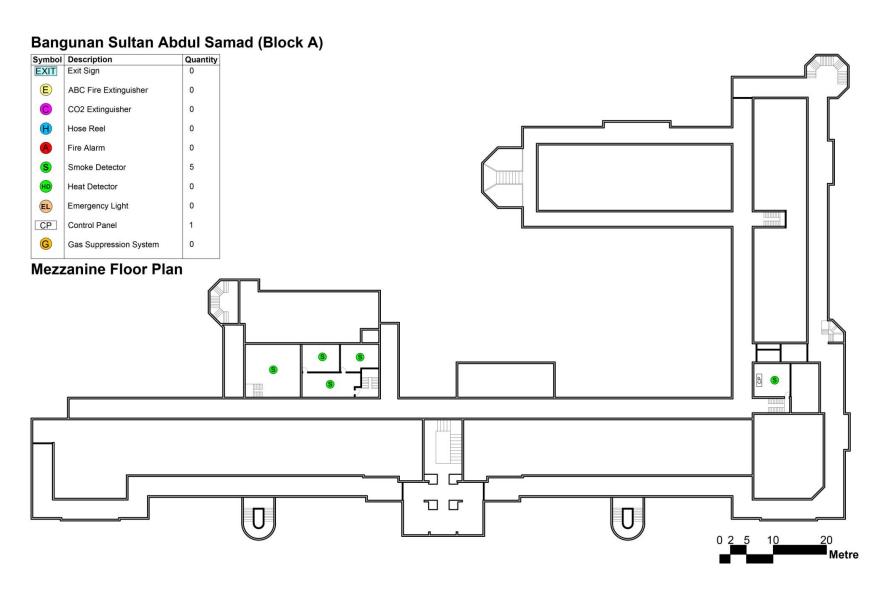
Location of active fire protection measures at Mezzanine Floor Level of Sultan Abdul Samad Building.
